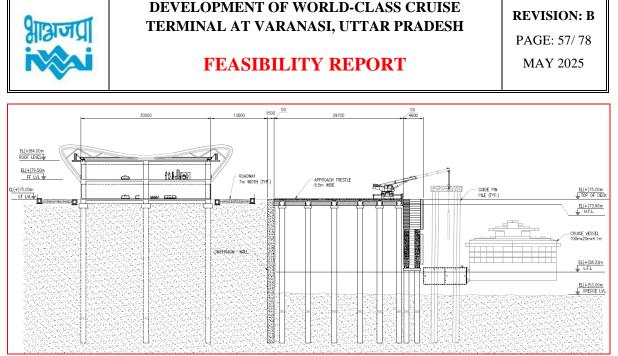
Typical Cross-section of Berthing facility at Low Flood level (+) 58.22m CD
